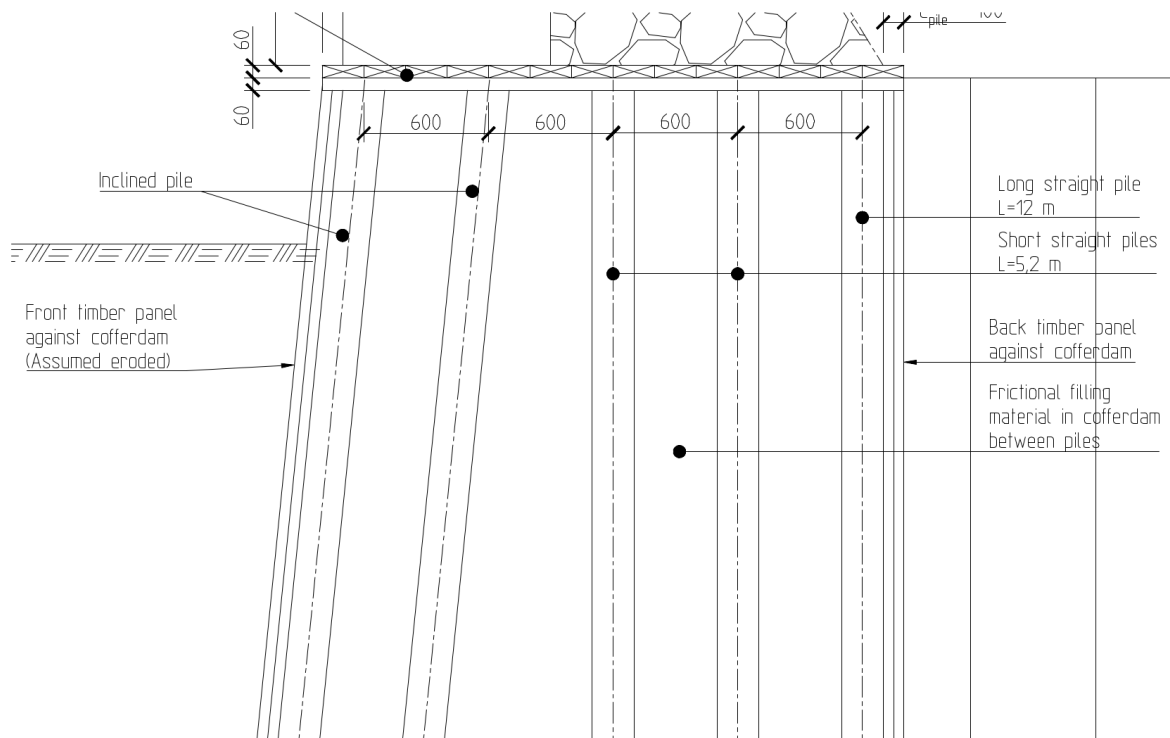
Layout of the pile foundation and canal bed of the Gothenburg wall.
